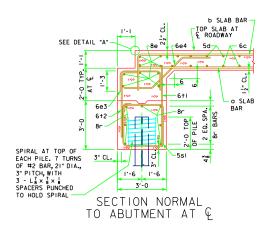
DETAILS ON THIS SHEET ARE TO BE USED ONLY WHEN ABUTMENTS ARE PLACED ON STEEL PILES. IF ROCK IS ENCOUNTERED CLOSER THAN 12' BELOW ABUTMENT FOOTING, SPECIAL ANALYSIS MAY BE REQUIRED.
